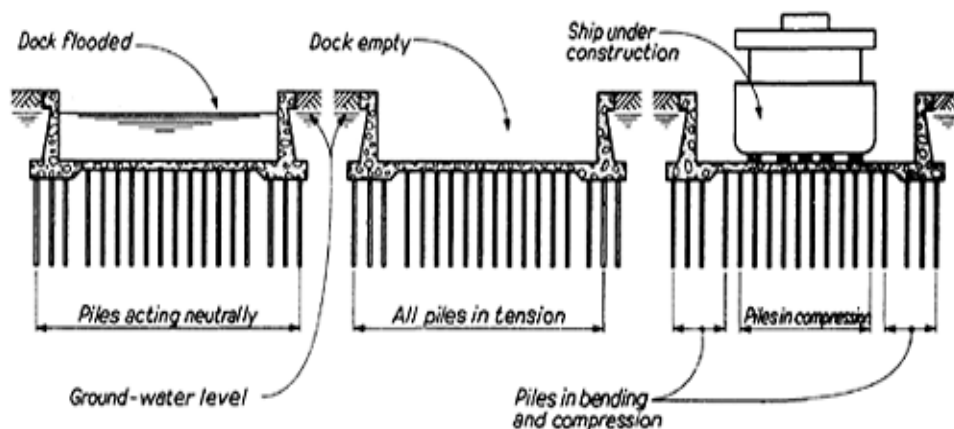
Tension/compression piles beneath floor of shipbuilding dock
